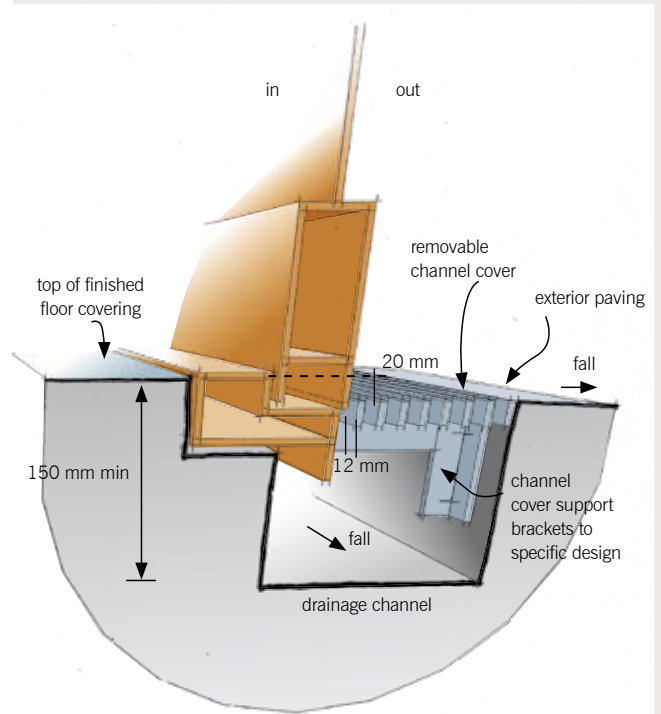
(b): Section through door for concrete floor slab, details for outward opening door.
